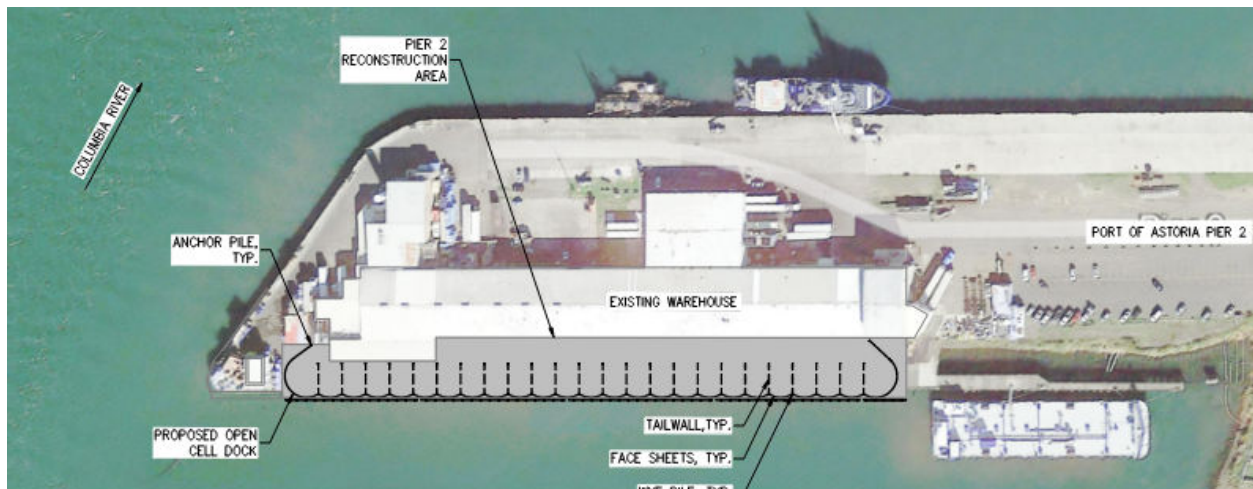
Pier 2 West Plan with OPEN CELL Bulkhead
